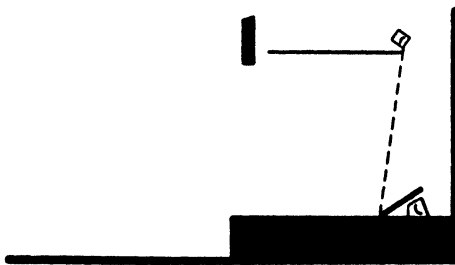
SECTION: INCLINED PLANE TO MASK LIGHTING
